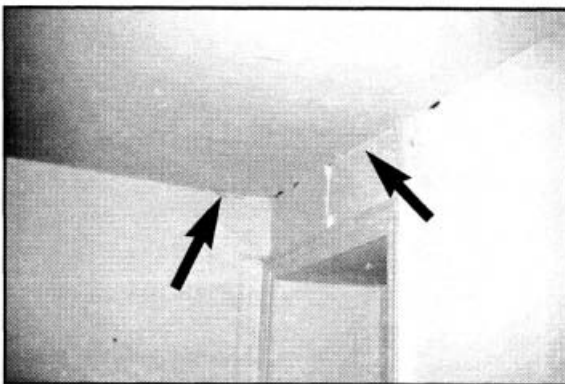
Centinela Adobe. Minor cracking developed in many locations at the ceiling line. Most adobe buildings have poor attachment between the roof and ceiling framing and the walls.
